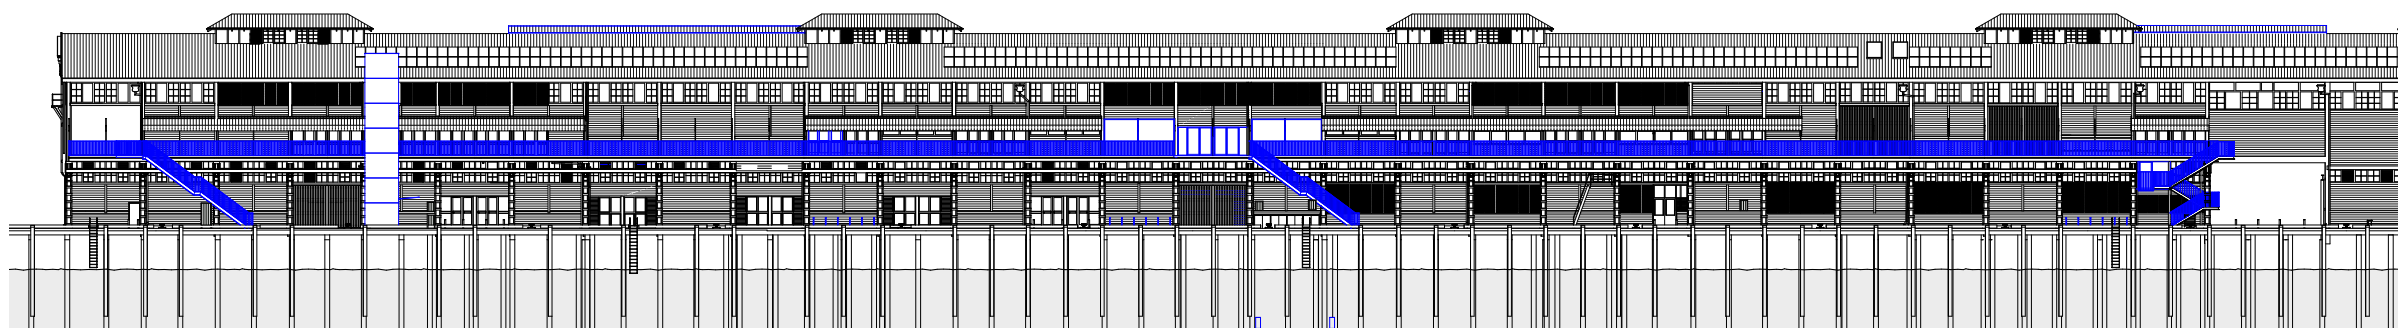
Proposed West elevation Wharf 4/5, (alterations shown in blue).
